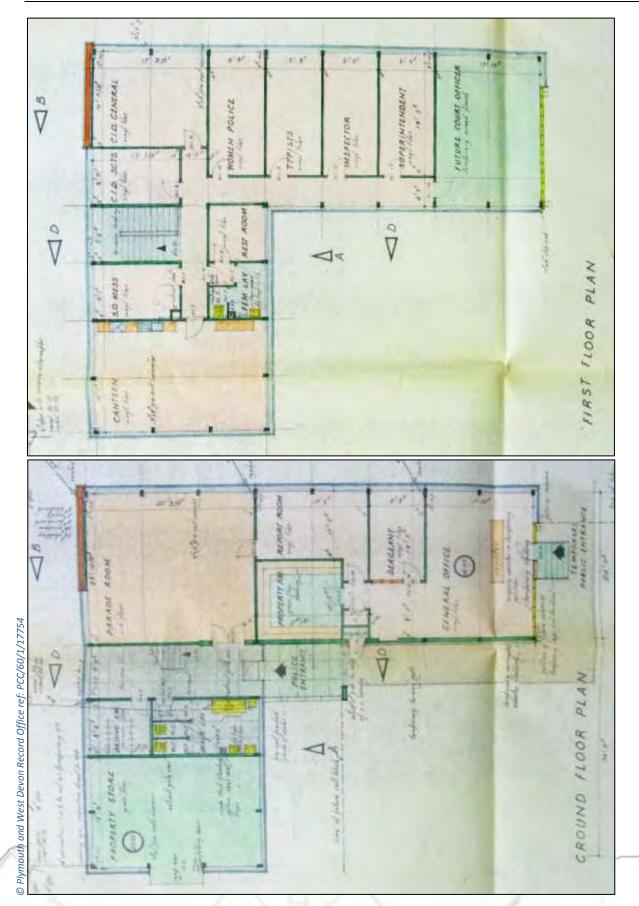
Ground and first floor plans of Princess Street Divisional Police Station, Plymouth, 1959.
